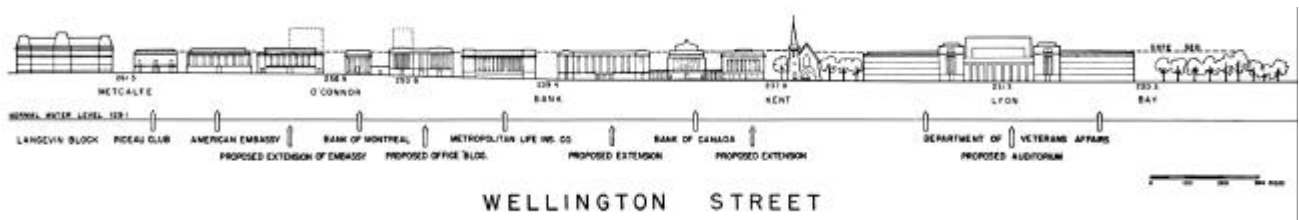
Proposed Wellington Street Facade, 1950 (Gréber Report)
